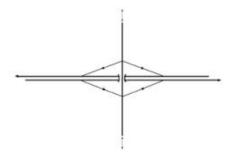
Haarlemmermeer solution – at a crossing R=3km Throughway – R=1km Opening up road (GOW)^d
